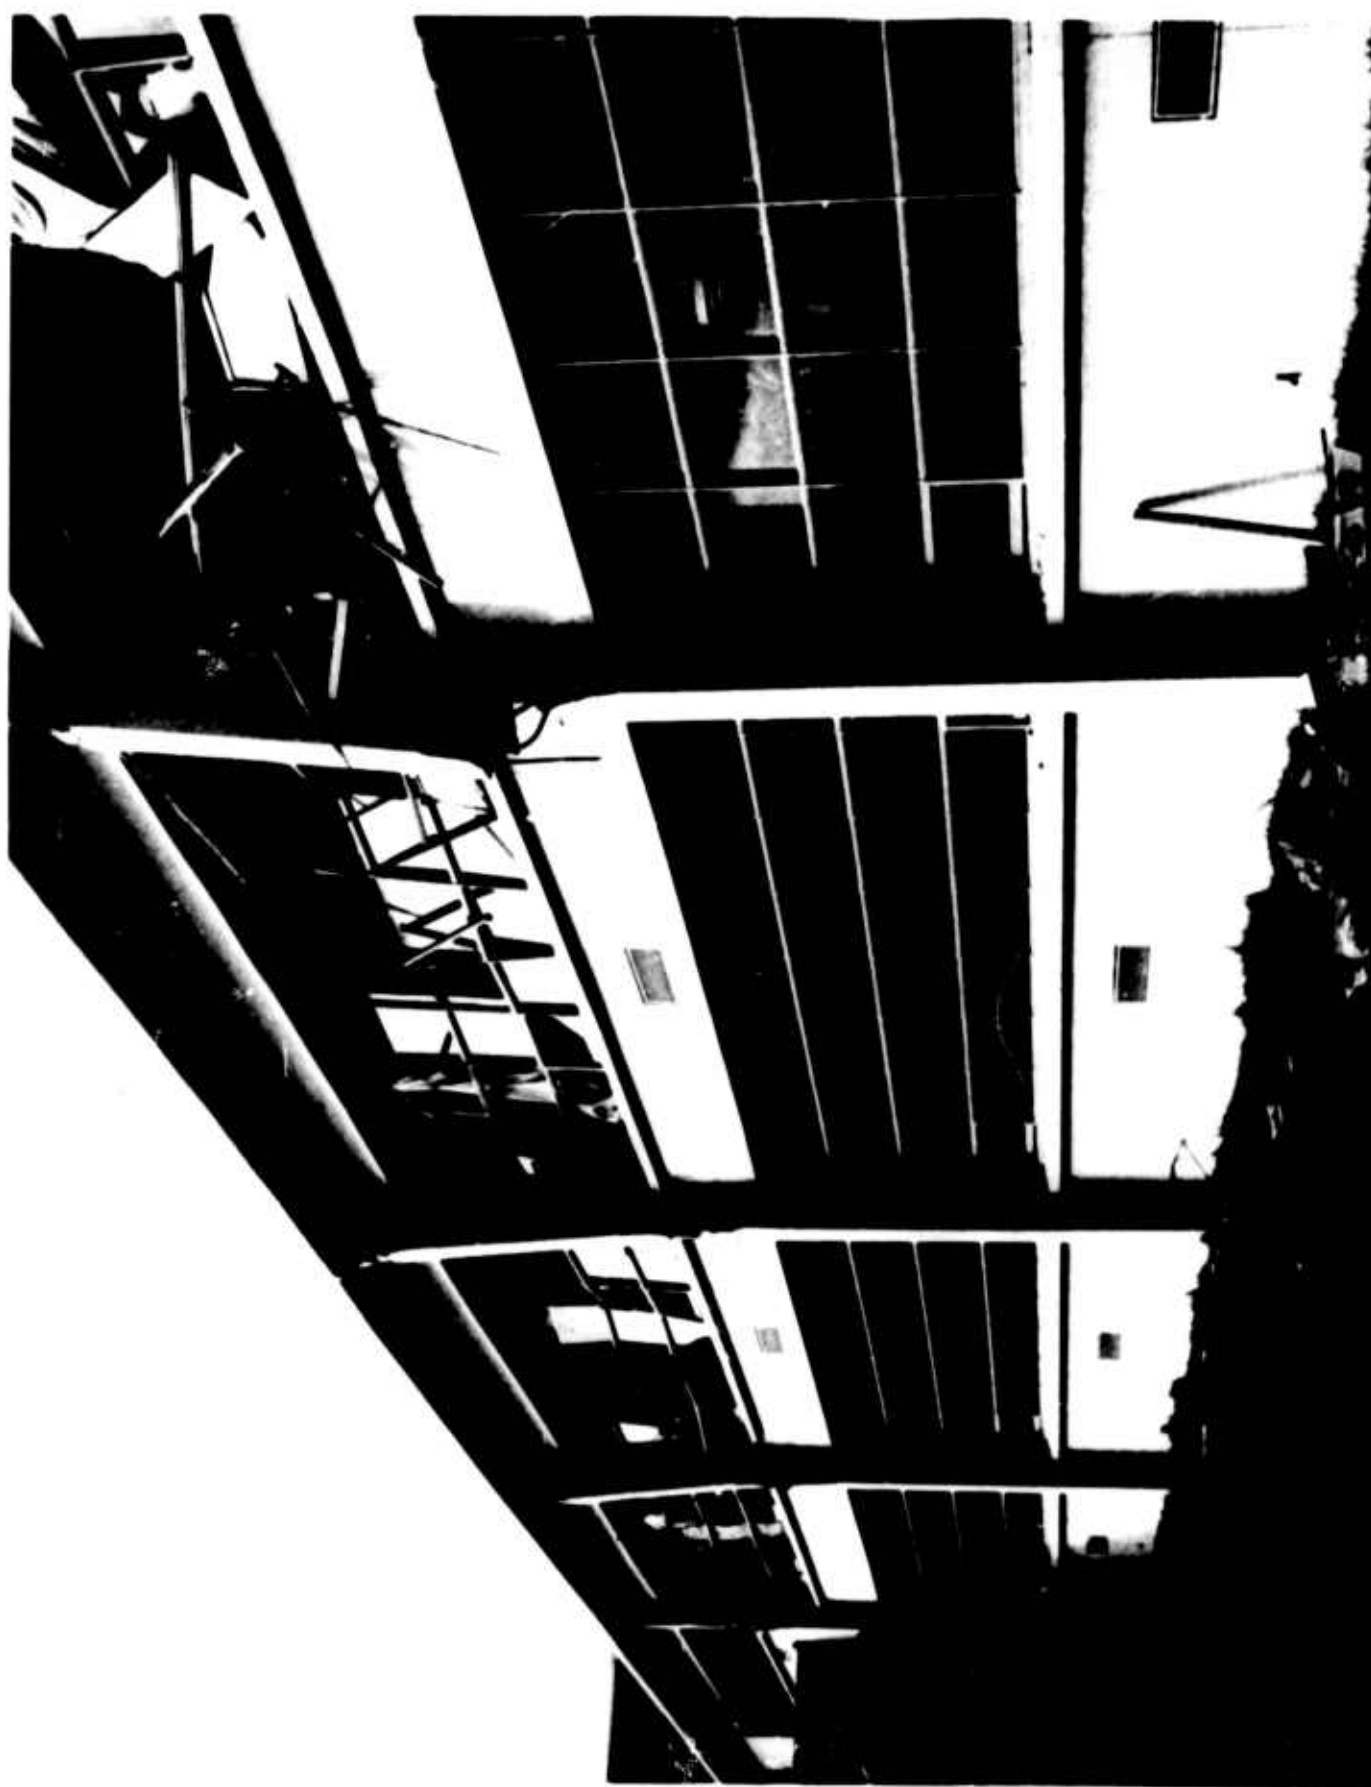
West Anchorage High School (Damage to second-story columns in south wall of wing B)
